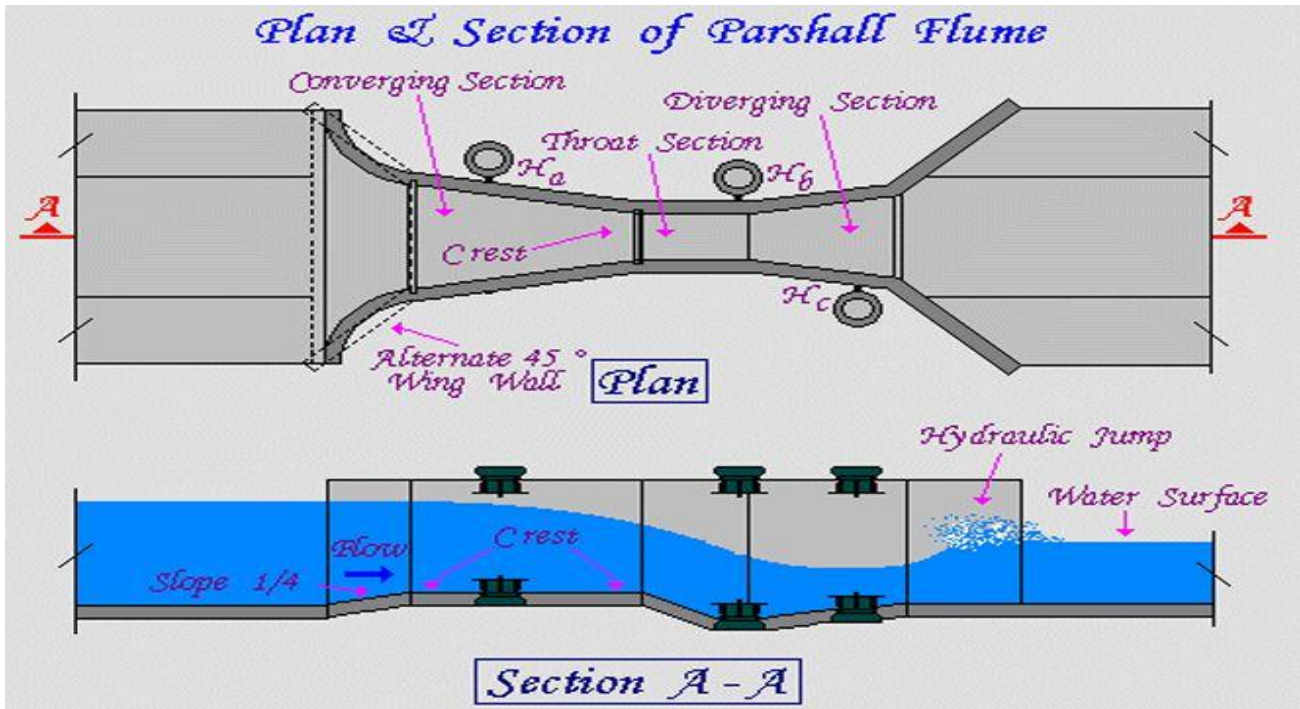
Plan and section view of sheet metal partial flume showing its component parts
